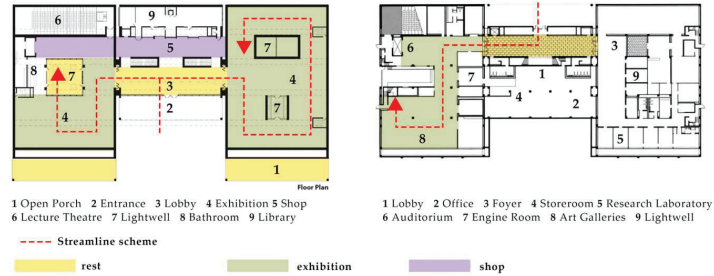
Floor Plan of the Kimbell Gallery (building layout and visitor routes).
